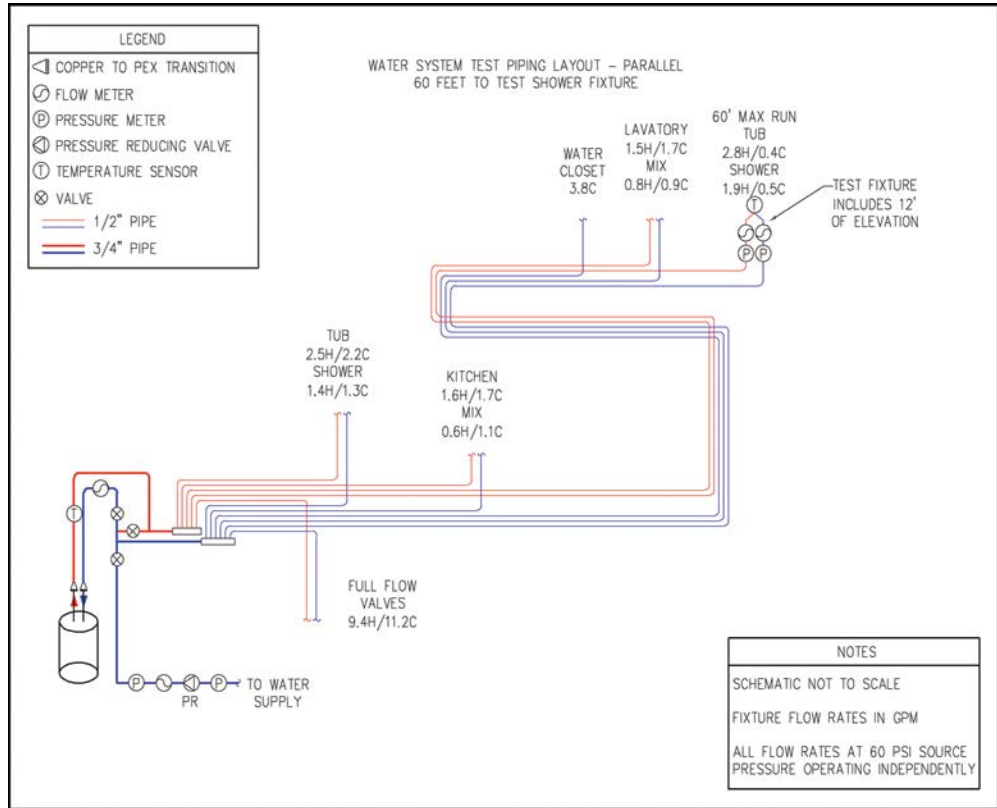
Water System Test Piping Layout – Parallel, 60' to TF
